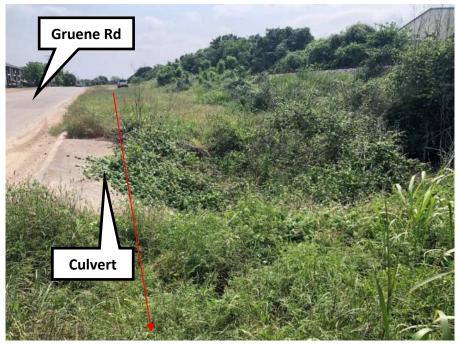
Storm Culvert Outfall on Gruene Rd (View to SW)
